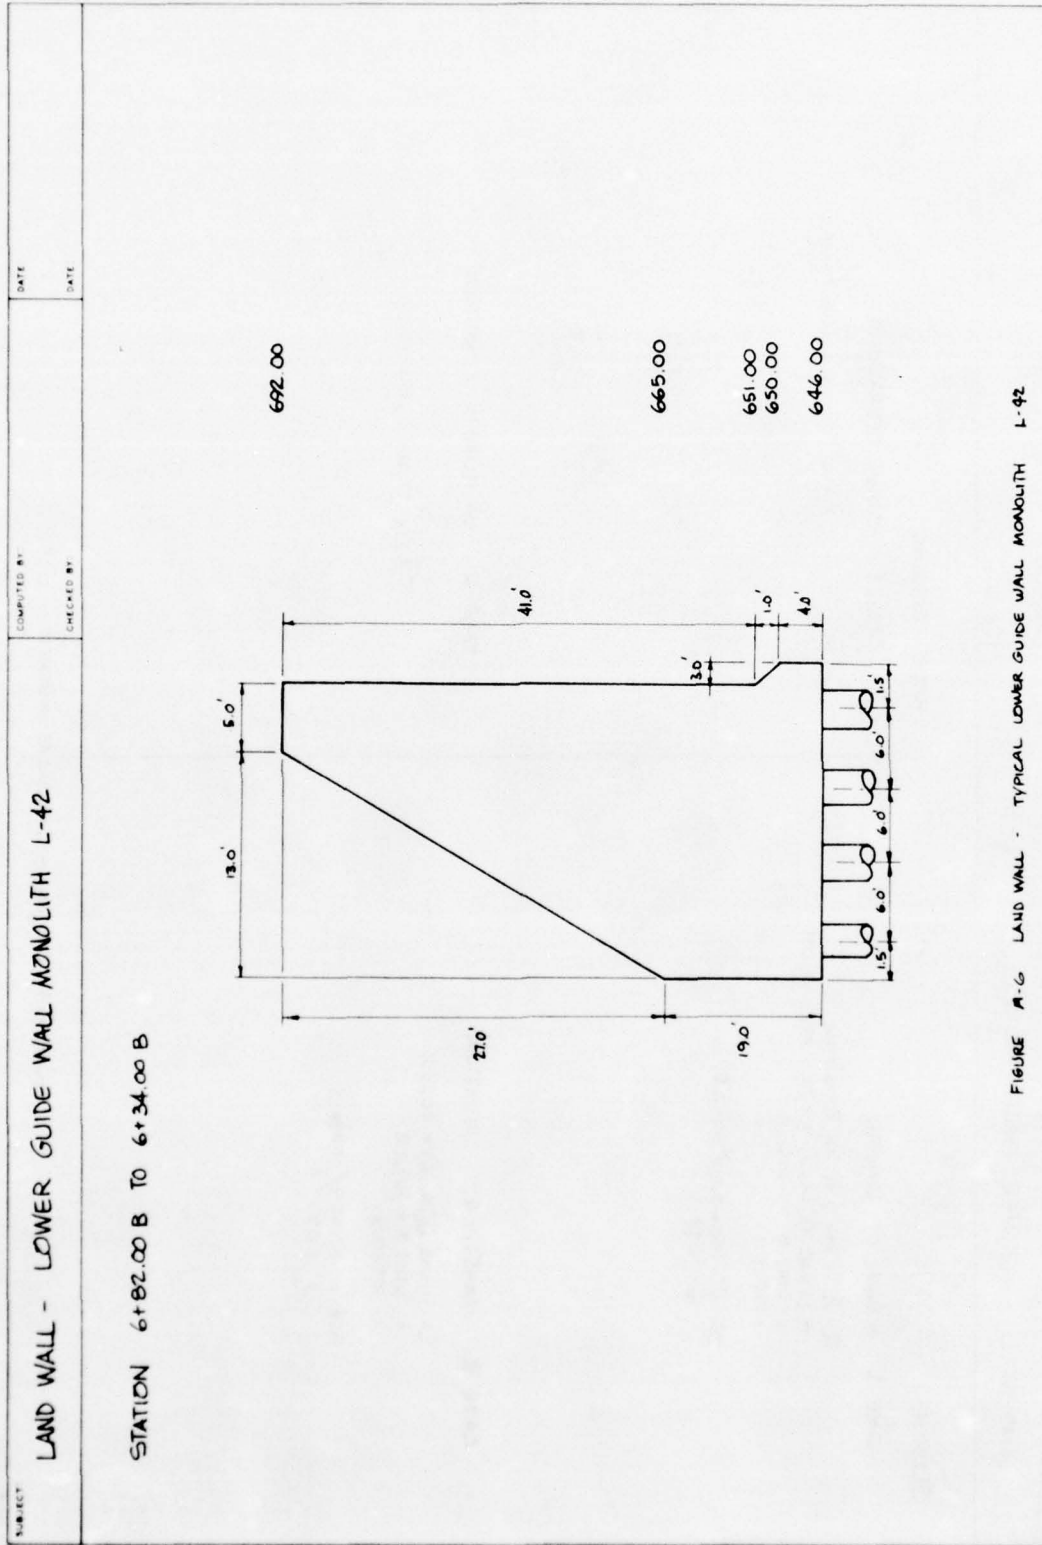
LAND WALL - TYPICAL LOWER GUIDE WALL MONOLITH L-42
